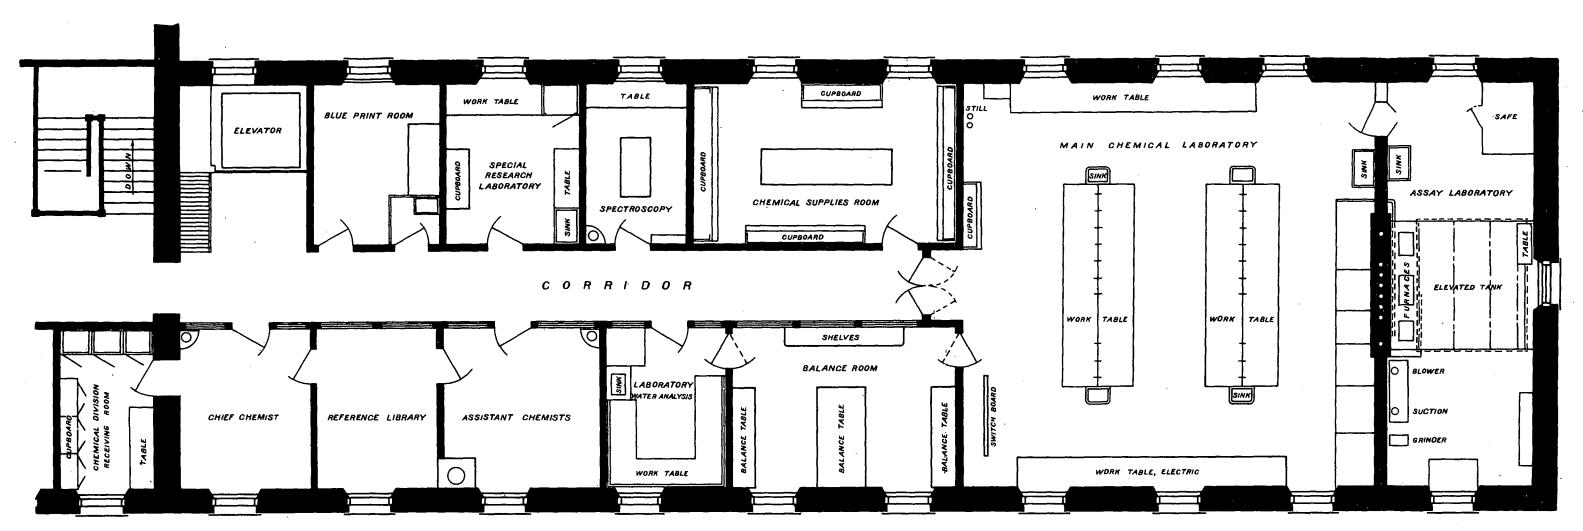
Plan of Chemical Laboratories, Mines Building, Sussex Street, Ottawa.
